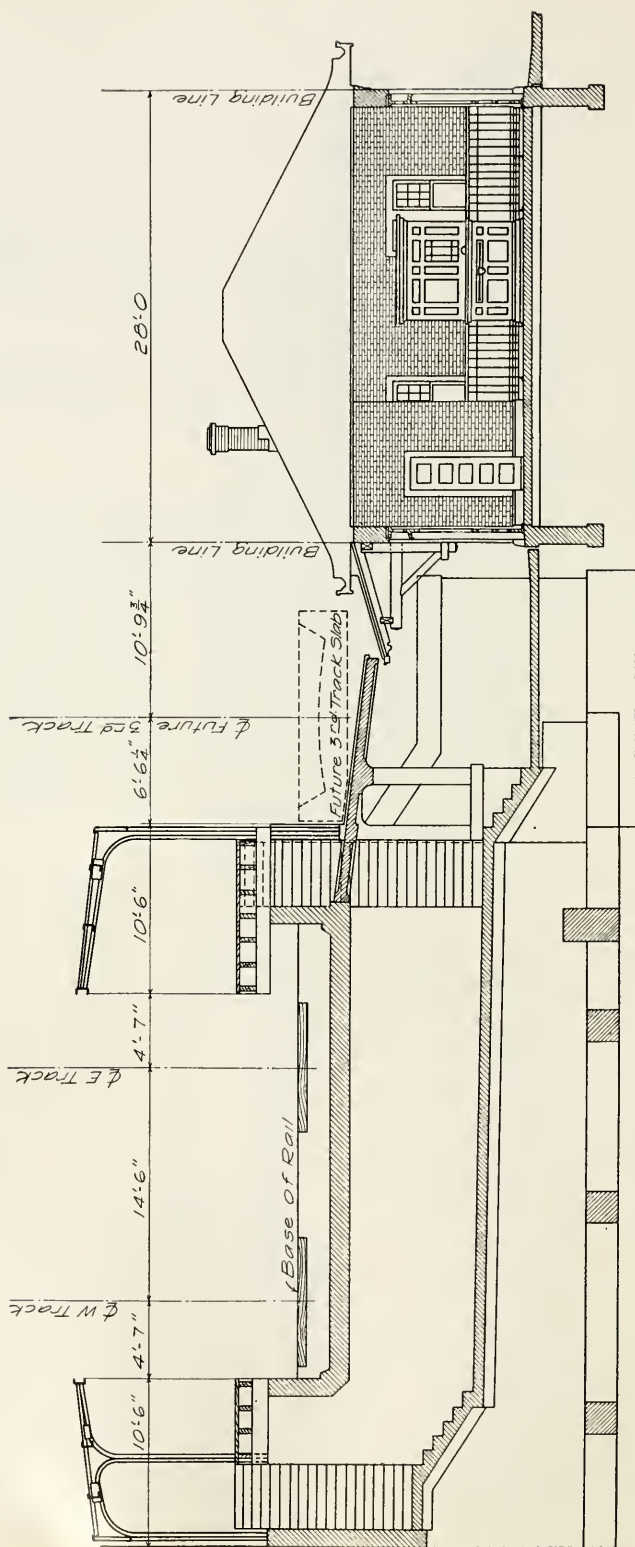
SECTION OF MAIN STREET STATION ON CENTER LINE OF BUILDING.
